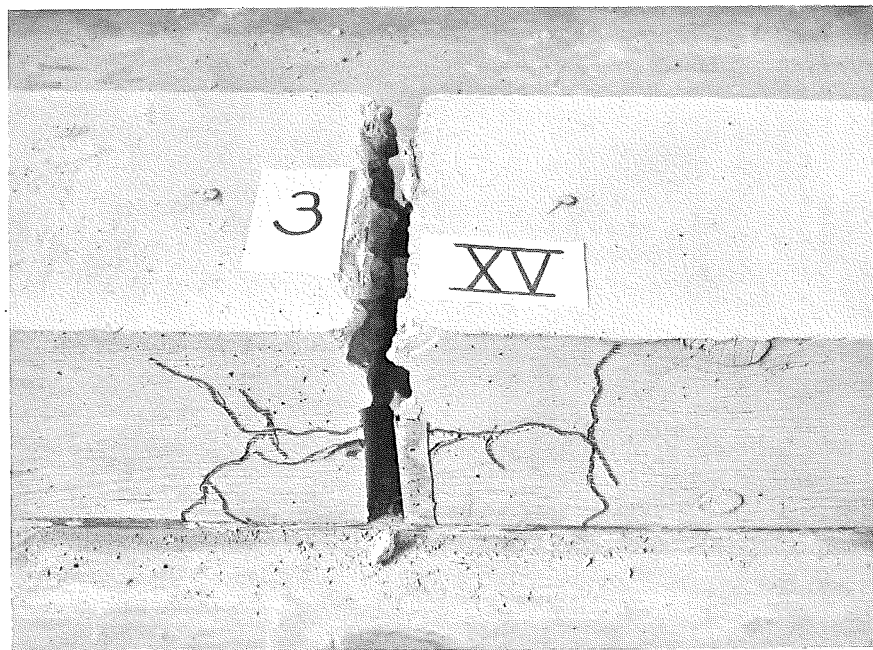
D - FAILURE OF SPECIMEN XV (SET E)
